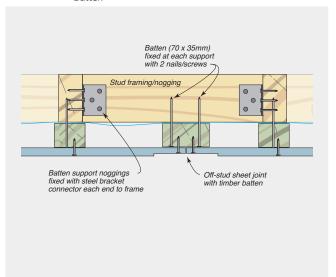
Texture Base Sheet Fixed to Off-stud Structural Timber Batten
